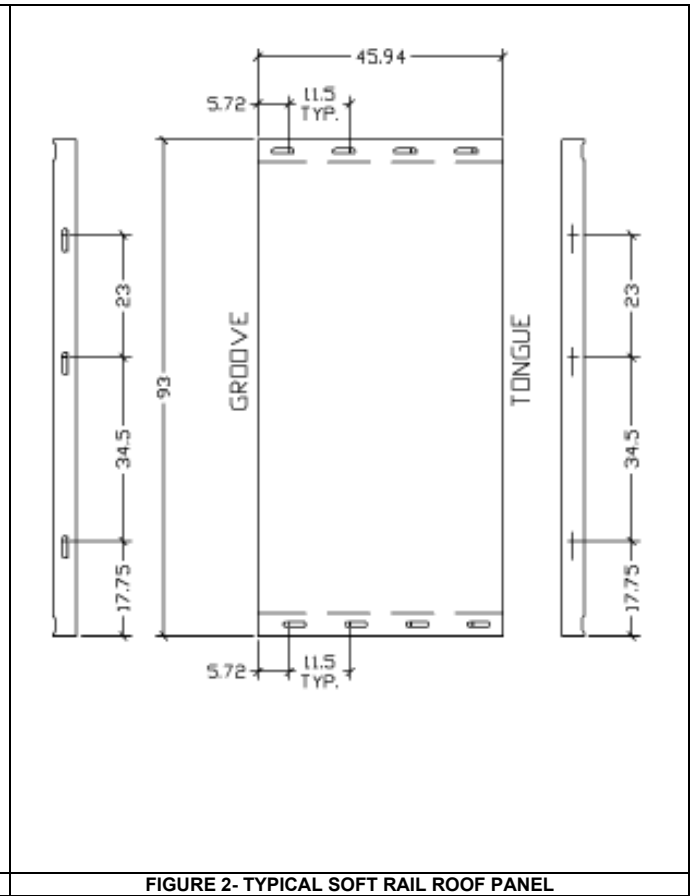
TYPICAL SOFT RAIL ROOF PANEL
